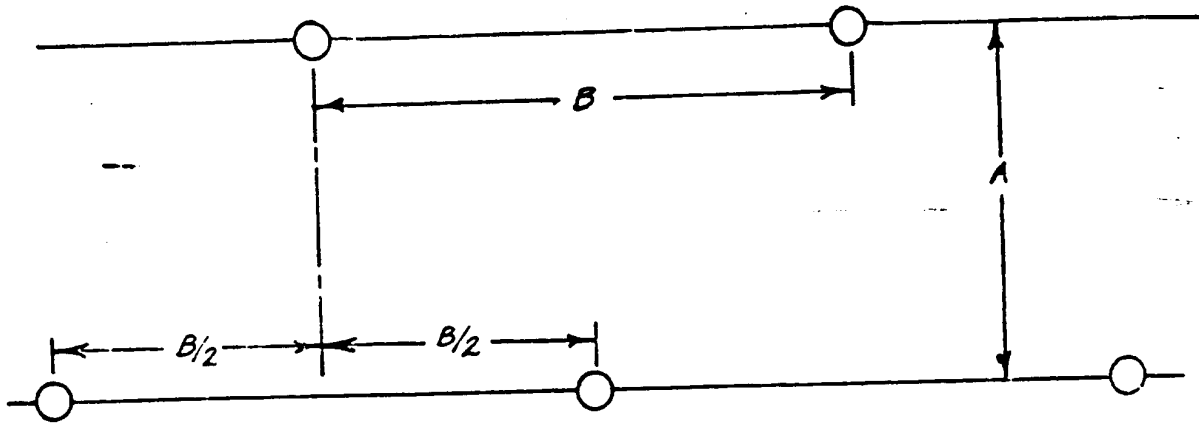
Sprinklers on Alternate Lines Staggered
